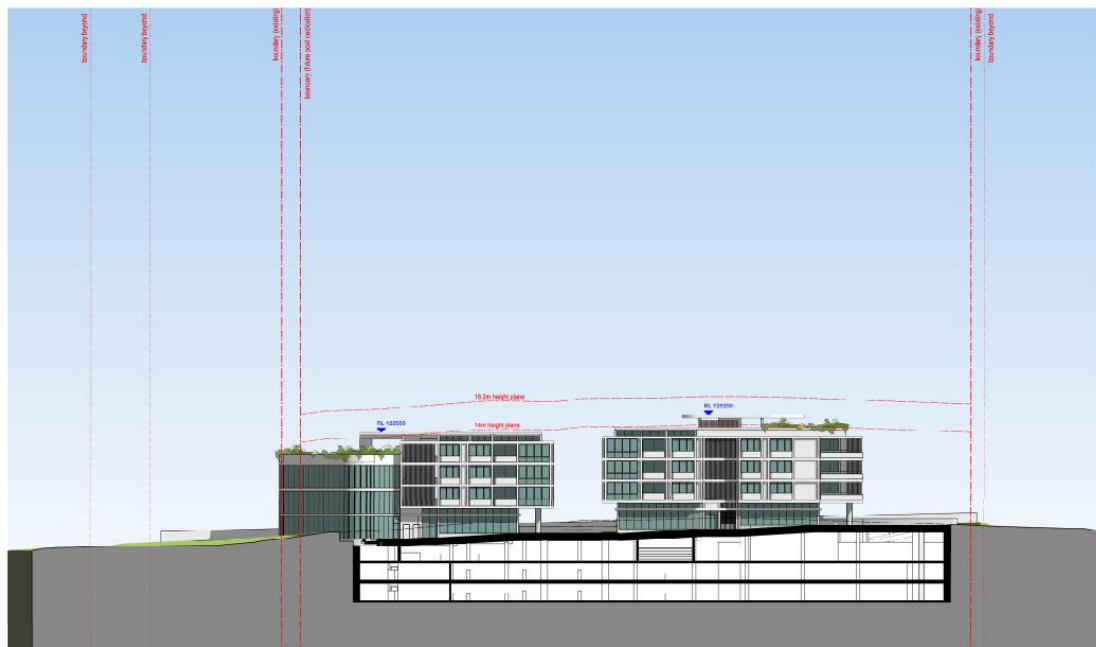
Section showing the residential and commercial premises along the west of the Project Area, with basement levels visible and the proposed building heights (Source: Kennedy Associates Architects, May 2025, 1804-SD0302)
